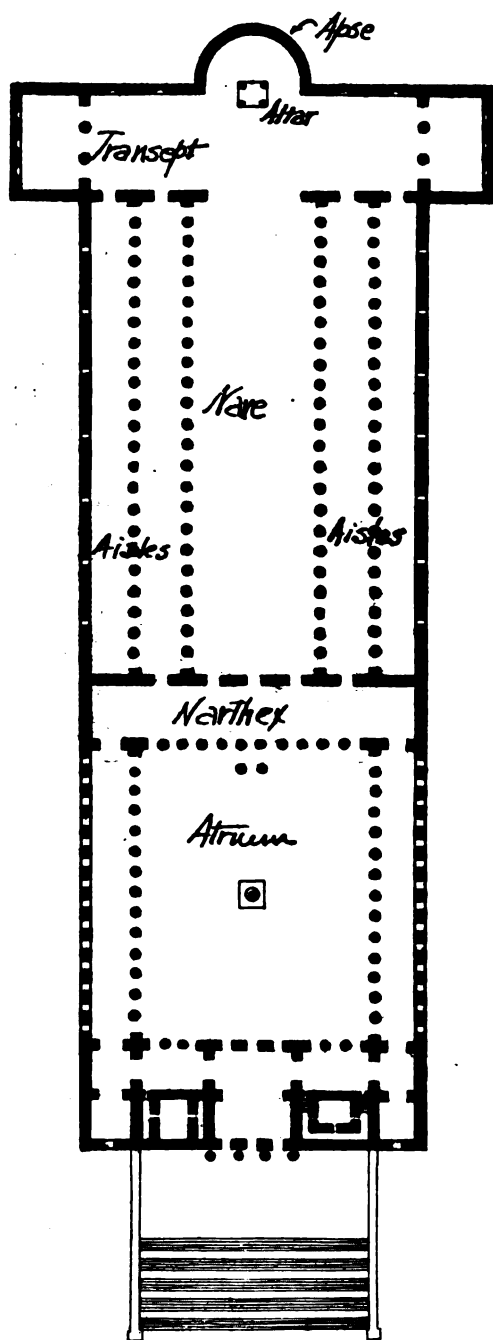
PLAN OF OLD ST. PETER'S, ROME. TYPICAL EXAMPLE OF COMPLETE TRADITIONAL BASILICAN PLAN.
